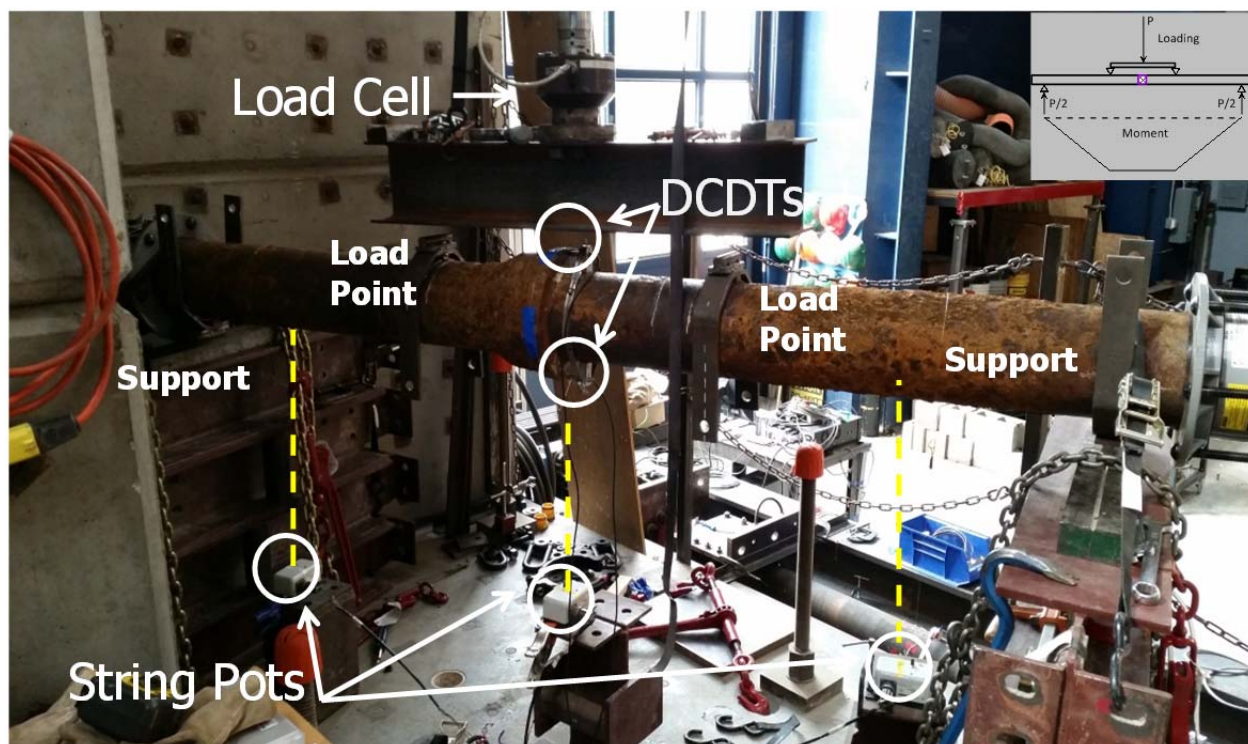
Flexure Test Apparatus with 6-in. (150-mm)-Diameter Test Specimen
